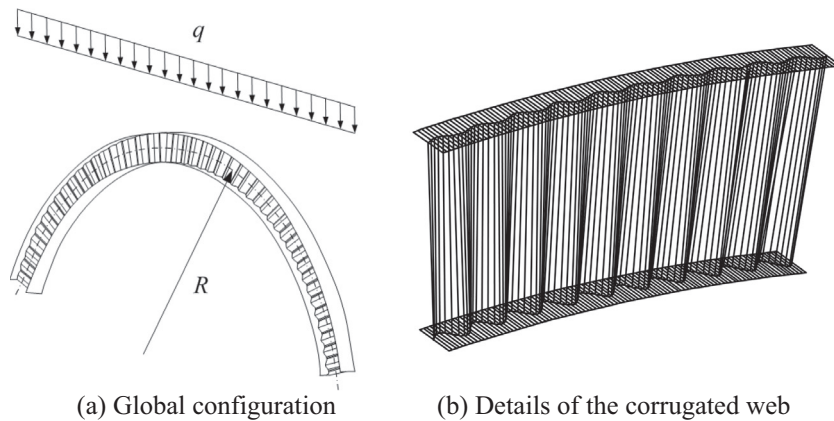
Steel I-section arch with a sinusoidal corrugated web. (a) Global configuration and (b) details of the corrugated web.
